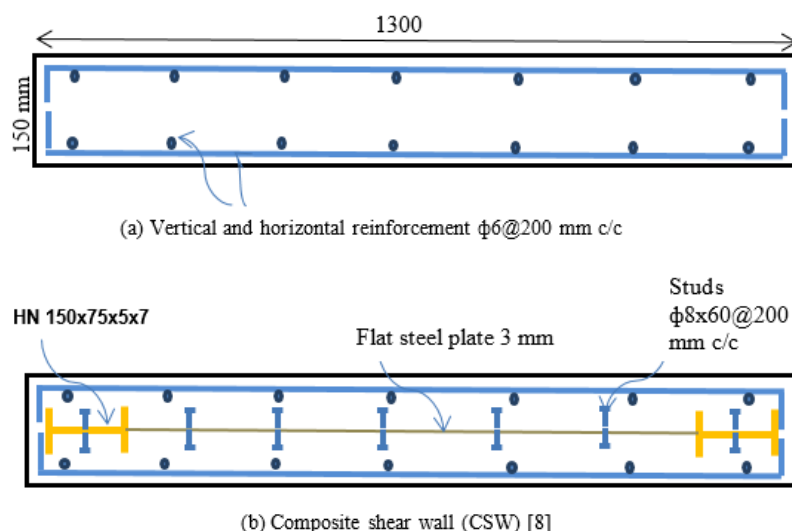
(a) Reinforced concrete shear wall (RCSW) and (b) Composite shear wall (CSW) [8].
